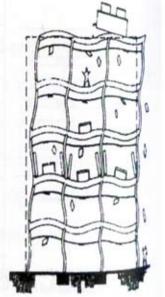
Failure of beam-column joints in a heavily damaged building on 1992 Erzinkan earthquake.
